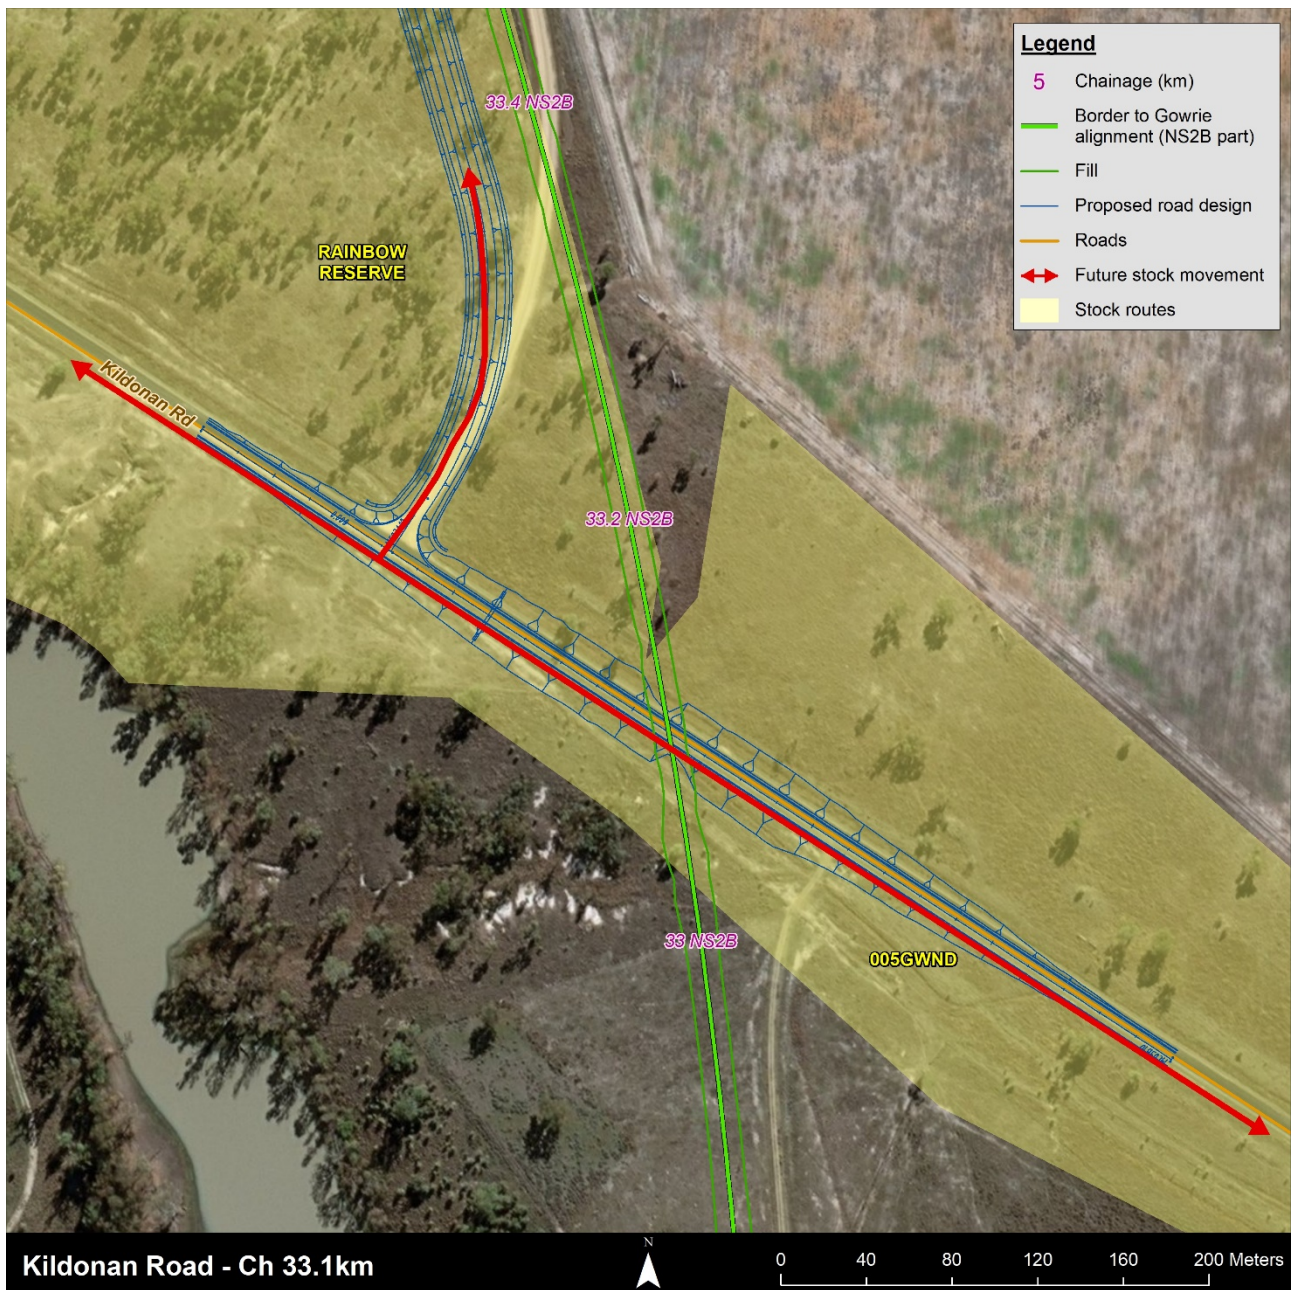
FUTURE STOCK ROUTE NETWORK CONNECTIVITY, WITH THE PROJECT: KILDONAN ROAD, CH 33.1 KM (NS2B)
